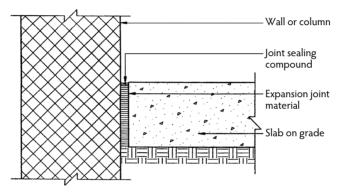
Isolation joint between a supported floor and a wall. (From ACI Committee 224, *Joints in Concrete Construction*, ACI 224.3R-95, American Concrete Institute, Farmington Hills, MI, 1995, pp. 1–44; PCA, *Building Movements and Joints*, Portland Cement Association, Skokie, IL, 1982.)
